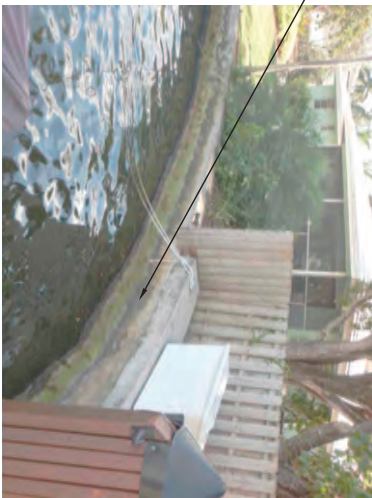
SOUTH END OF SEAWALL 29, LOOKING SOUTH
